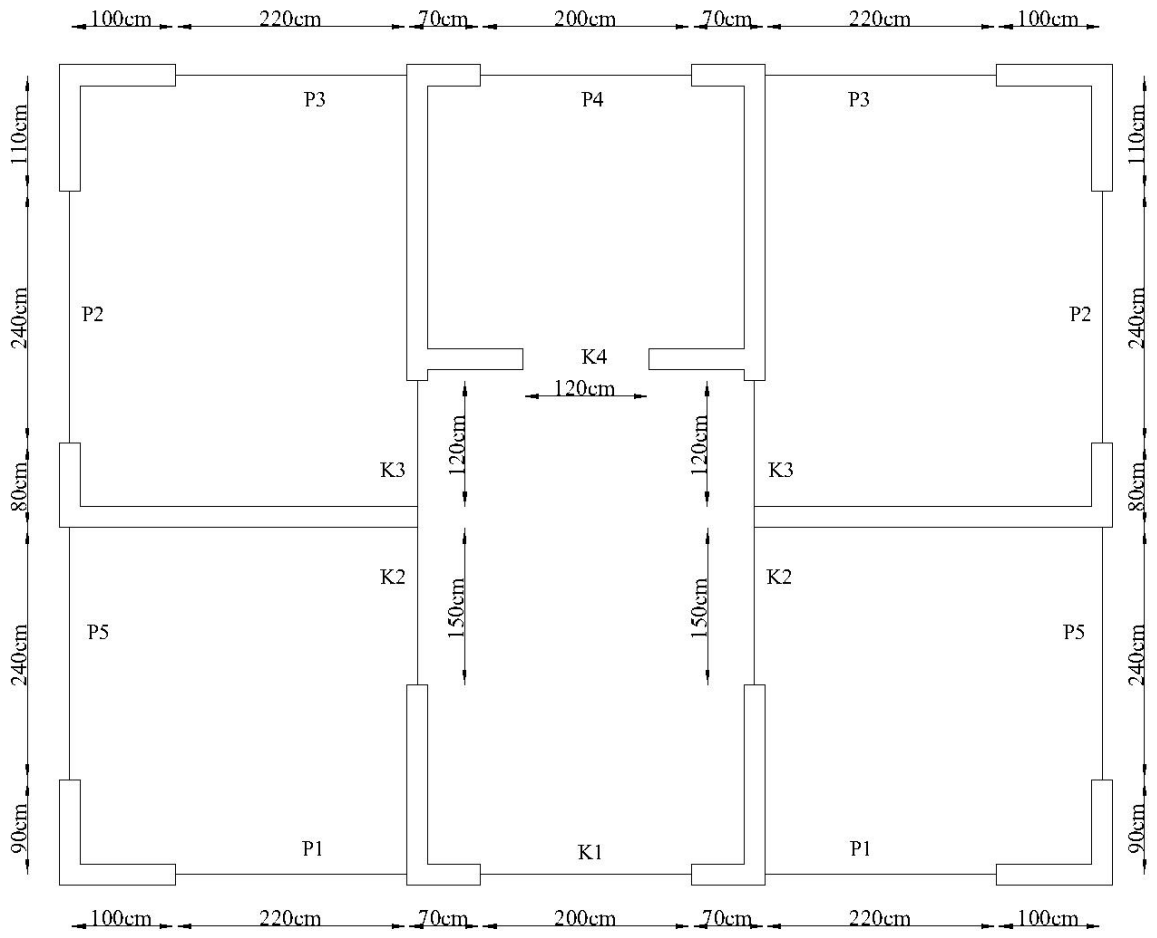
3. Plan geometry of the masonry building model of R1W3 subclass.
